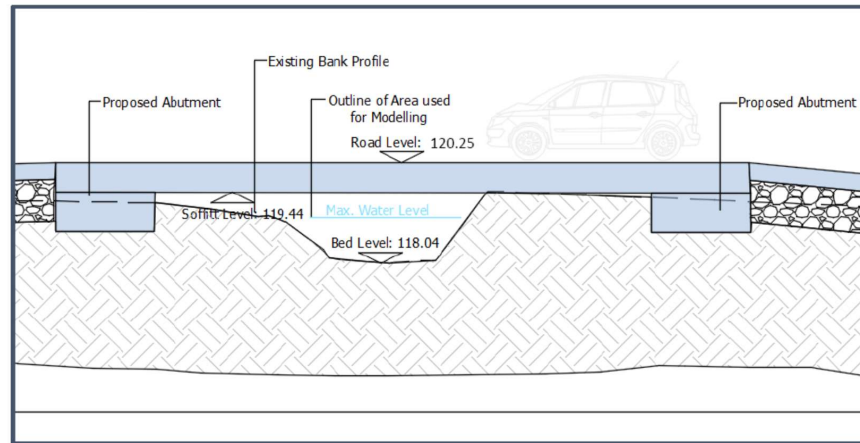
Extract from SSFRA fig.5.8 – Typical section at Stream Crossing
